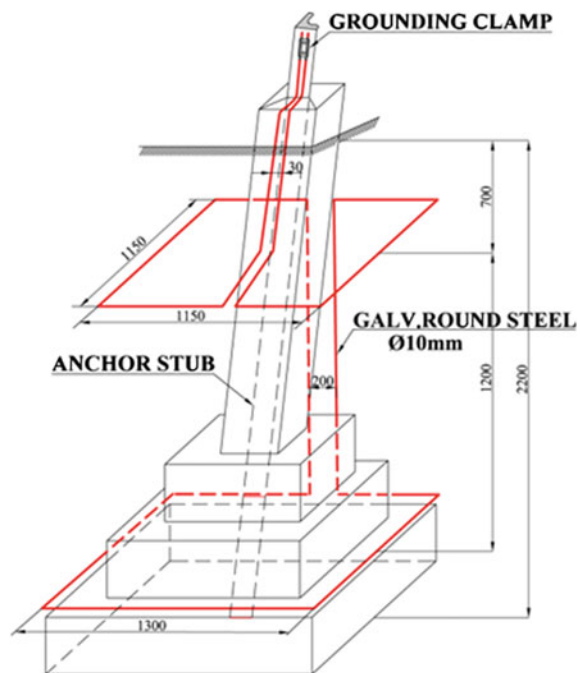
Type “A” grounding system—here shown the foundation of one foot of the 110 kV tower with grounding strip around the foundation
